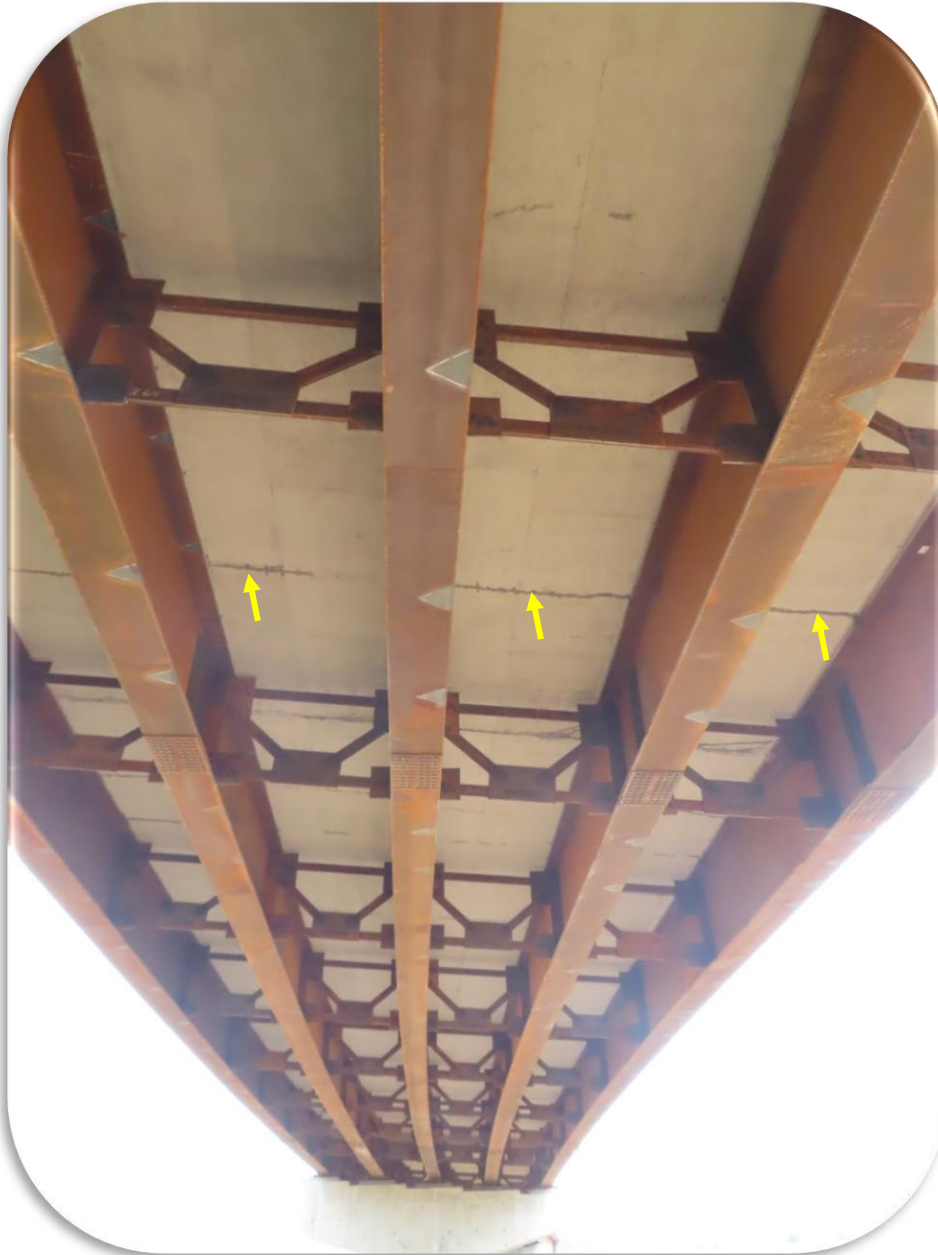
Underside of Rarus/Silver Bow Creek Bridge D - 2020 inspection - Span 2, Typical transverse crack at arrows.
